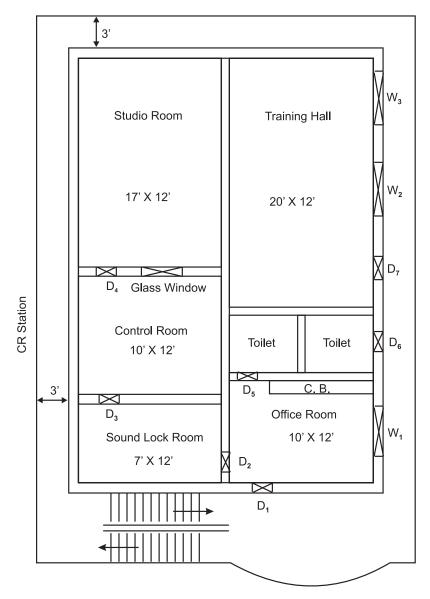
A Sample floor plan of a CRS (Courtesy the author)
